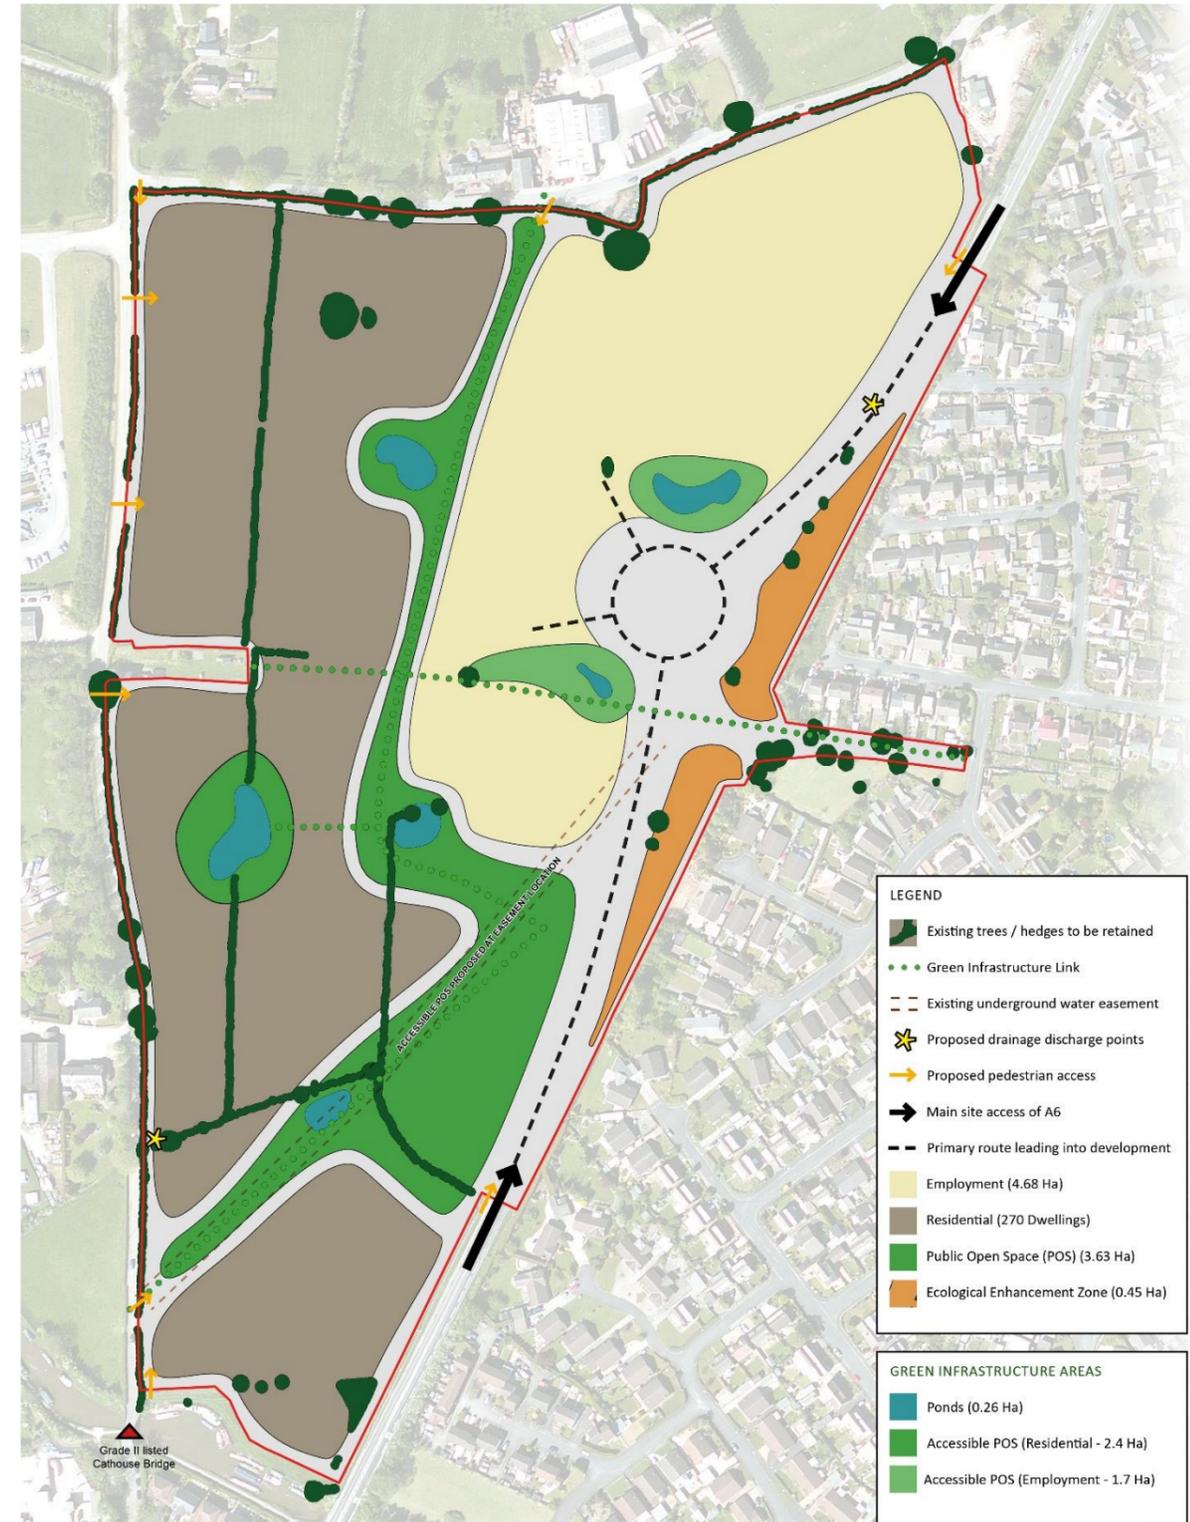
B – Masterplan with roundabout (refer to Appendix C)
